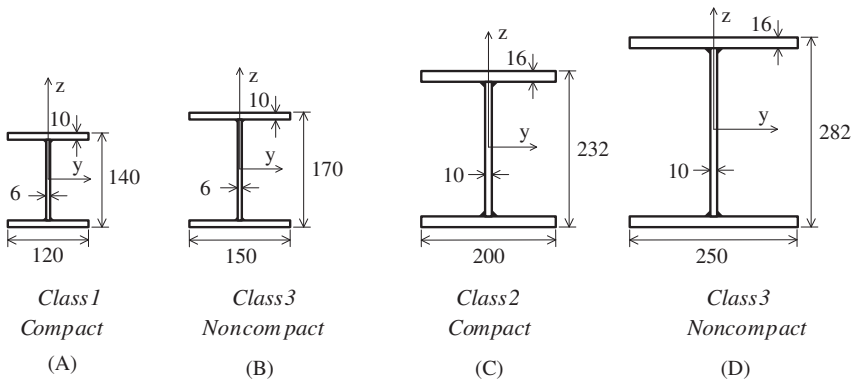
Nominal cross-sectional dimensions of welded H-sections: (A) Section H1, (B) Section H2, (C) Section H3, and (D) Section H4.
